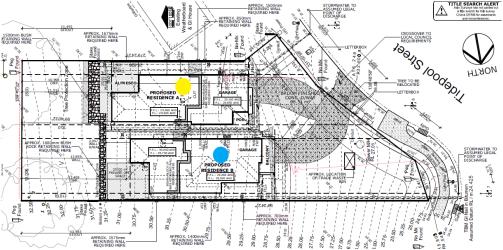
Layout of Proposed Development Showing Proposed Dwellings A (yellow dot) and B (blue dot)
